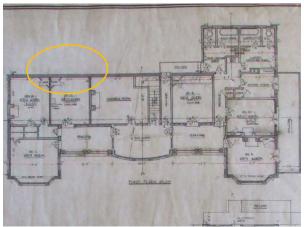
Original first-floor plan with the location of the subject fire escape balcony shown (circled). The emergency egress from Bedroom 2 and escape balcony is not shown on the original plans.
